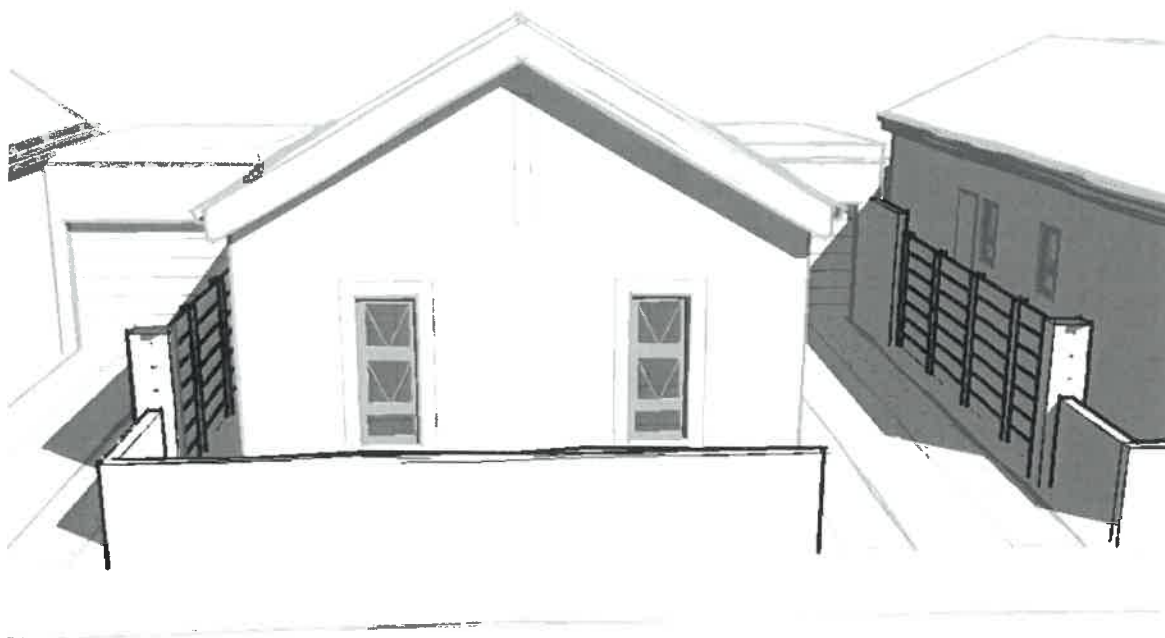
Minimum Requirement of a front boundary wall, should one opt to build a wall
